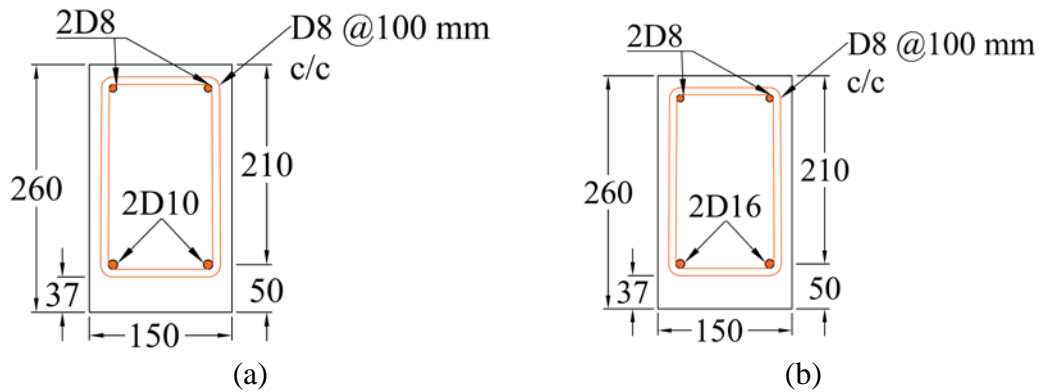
Reinforcement details (dimensions in mm): a) Beams with $\rho_s=0.5\%$, b) Beams with $\rho_s=1.28\%$
